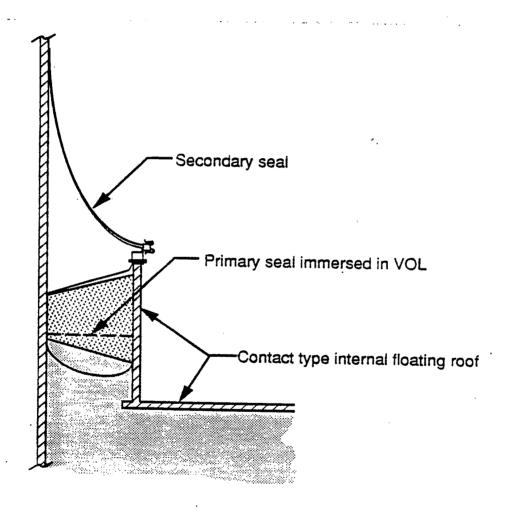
Rim-mounted secondary seal on internal floating roof.
